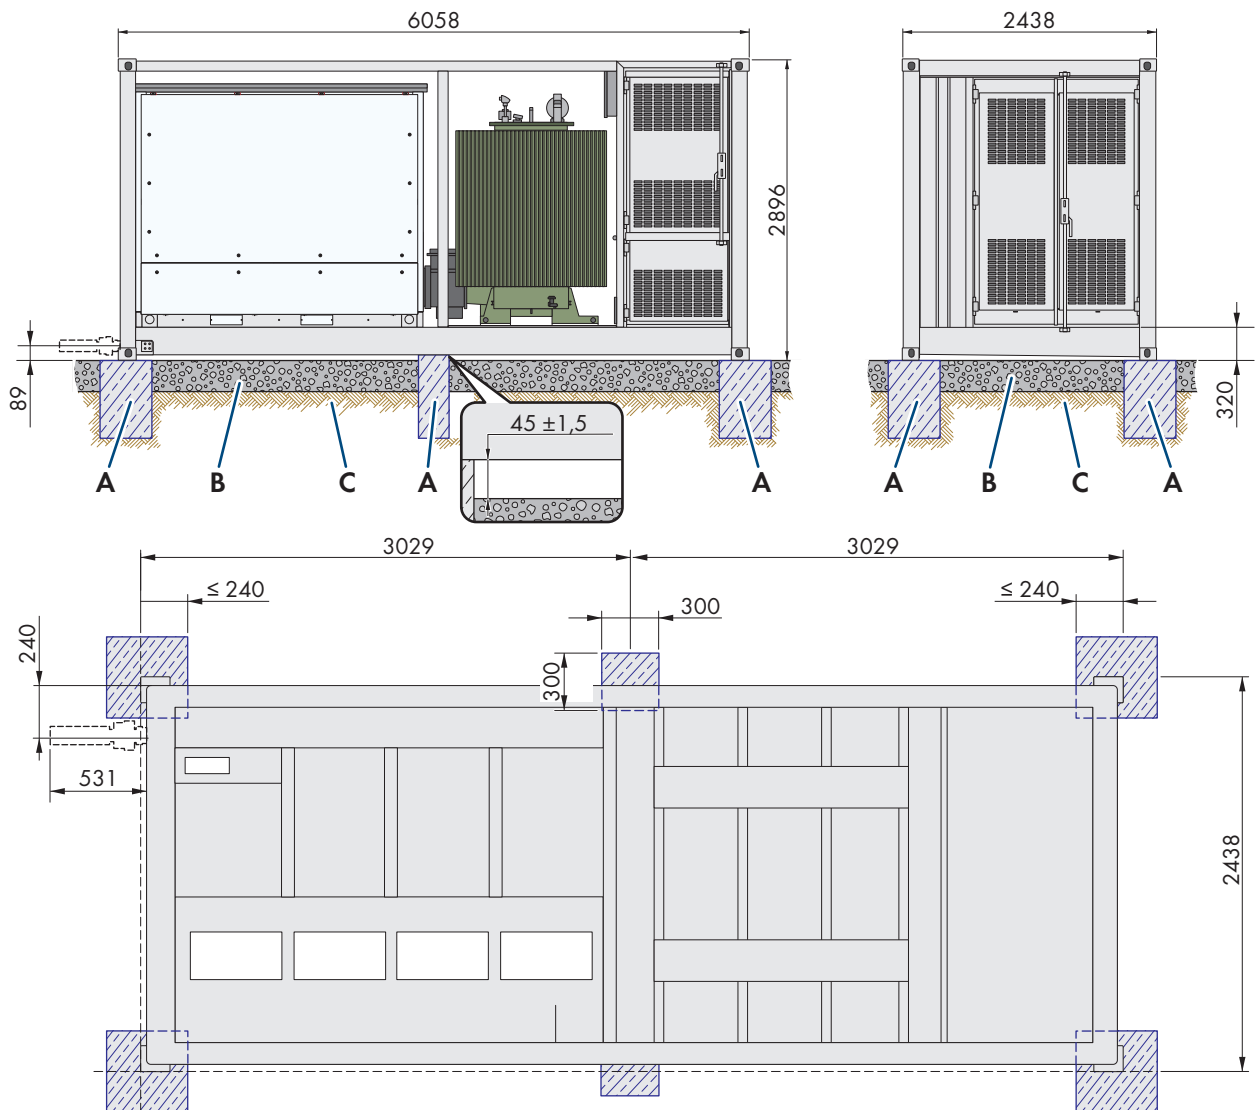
Mounting option with pile foundation (Dimensions in mm)
